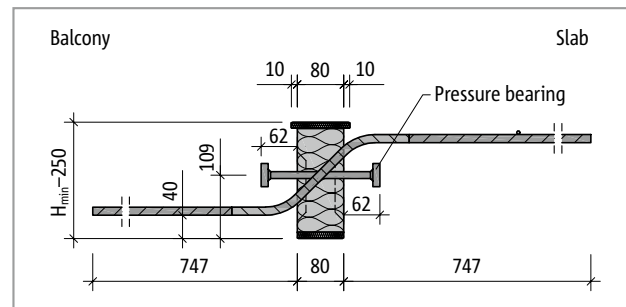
Schöck Isokorb® T type Q-P-V8 to Q-P-V9: Product section
